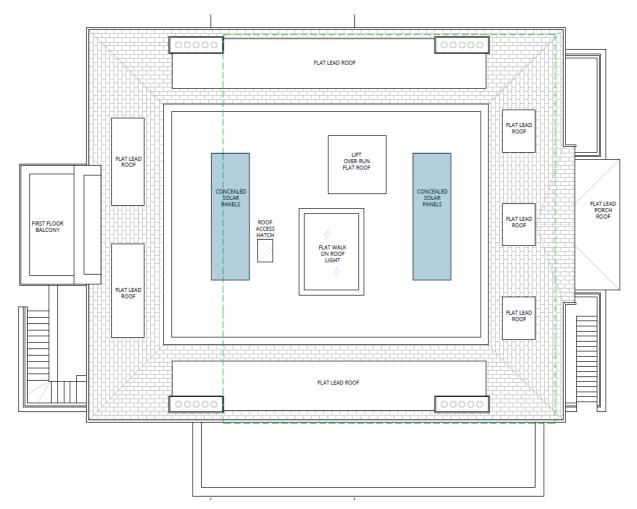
Proposed PV layout for 77 Avenue Road, indicative PV location highlighted in blue
